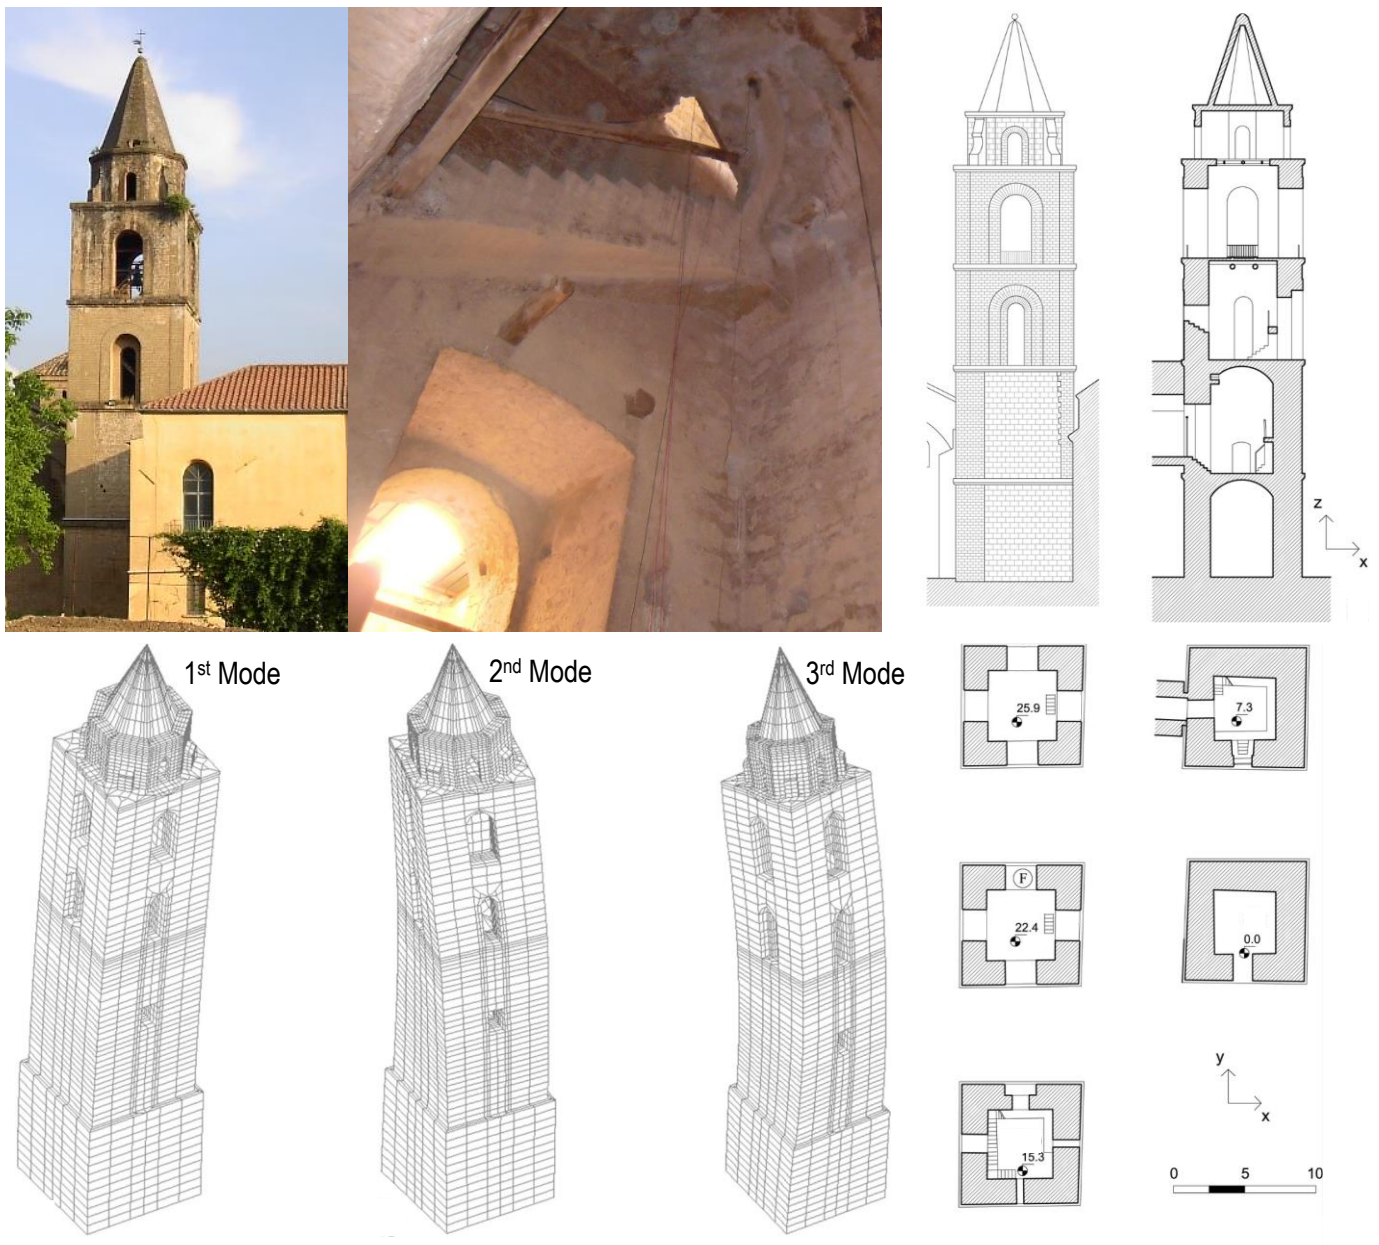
The bell tower of Santa Maria a Vico: general view, internal view, façade, sections, mode shapes
